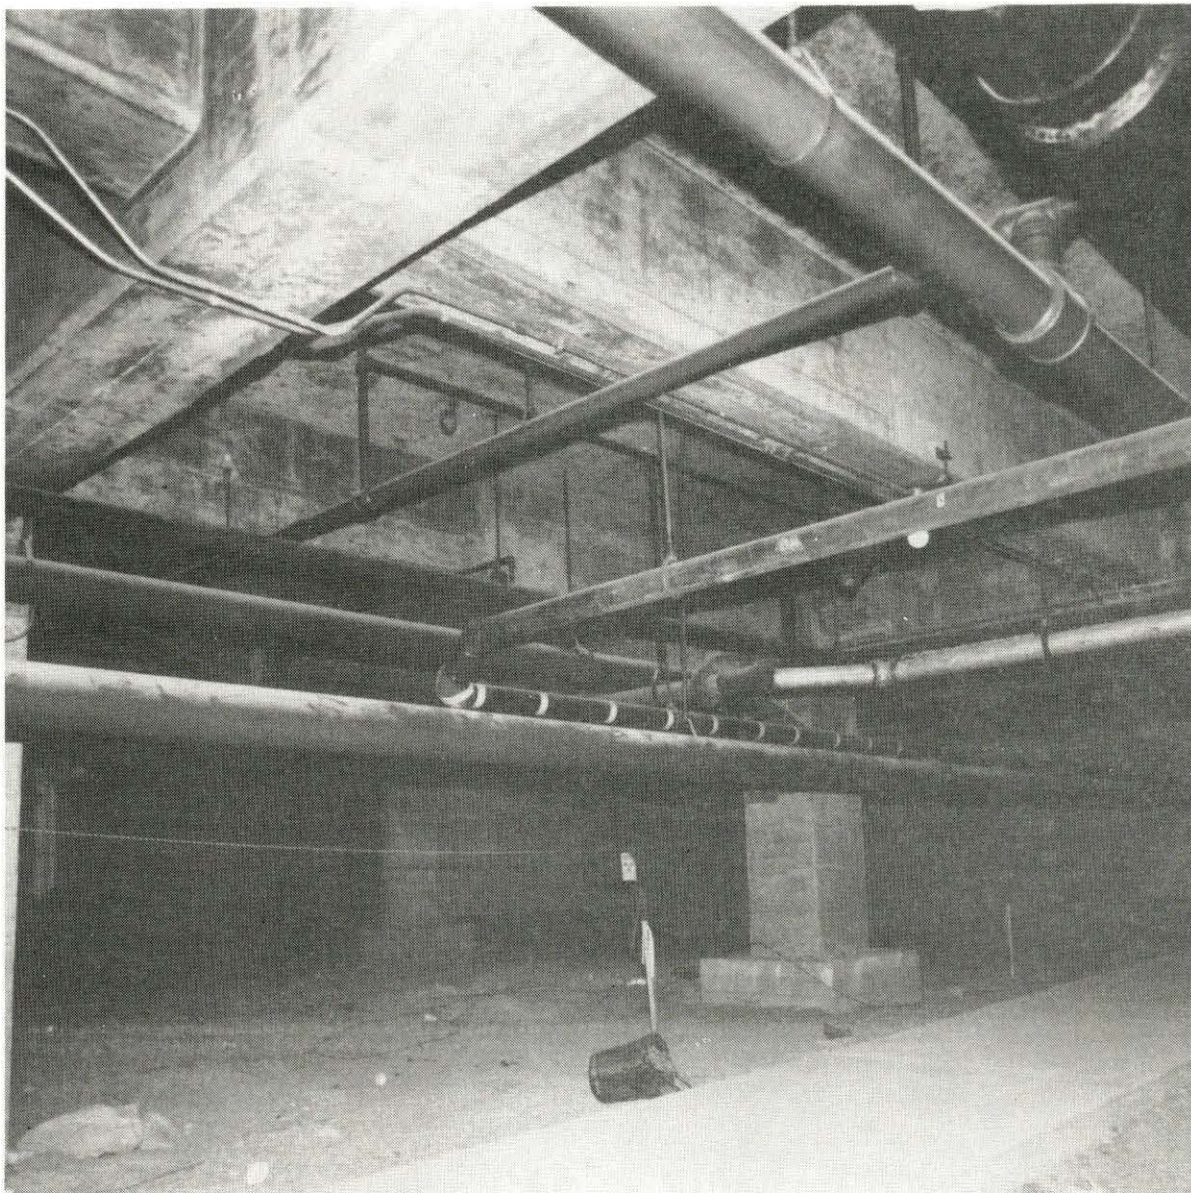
East end basement of Building 9204-1, looking south into Section III.
